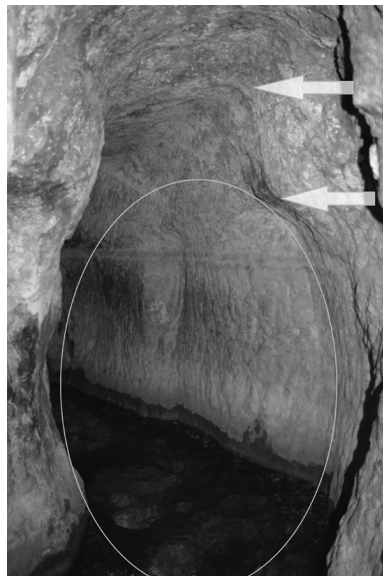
Tunnel VI at Jerusalem carried water from the Gihon Spring to the bottom of Warren's Shaft (Frumkin and Shimron 2006, 234), and it predated Hezekiah's Tunnel. This tunnel had a hewn barrel-shaped vault ceiling. At a later stage, the ceiling was raised and cut in a square style. (Photography by Frumkin.)
